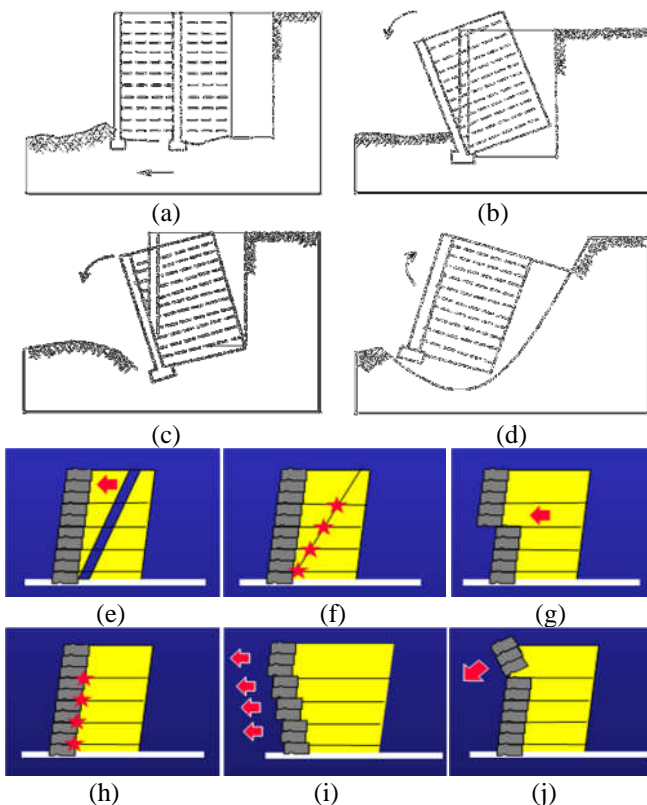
Failure modes of reinforced earth wall (External failure (a) basal sliding, (b) overturning, (c) bearing capacity failure, (d) overall sliding; Internal failure (e) Pull-out failure, (f) breakage of reinforcement, (g) internal sliding, (h) breakage of connector, (i) shear failure of facing wall, (j) failure of upper facing block)
